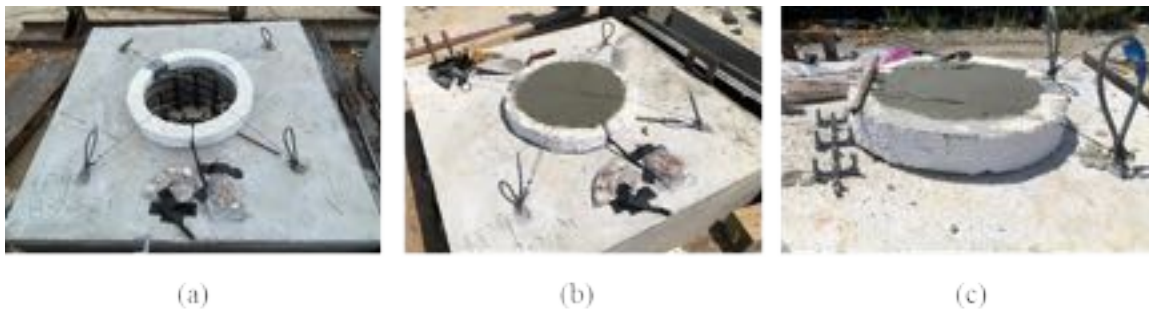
Plug construction: (a) 3-inch cylindrical form on top of cap before casting, (b) after casting the plug and (c) close up of the 3-inch cylindrical form.
